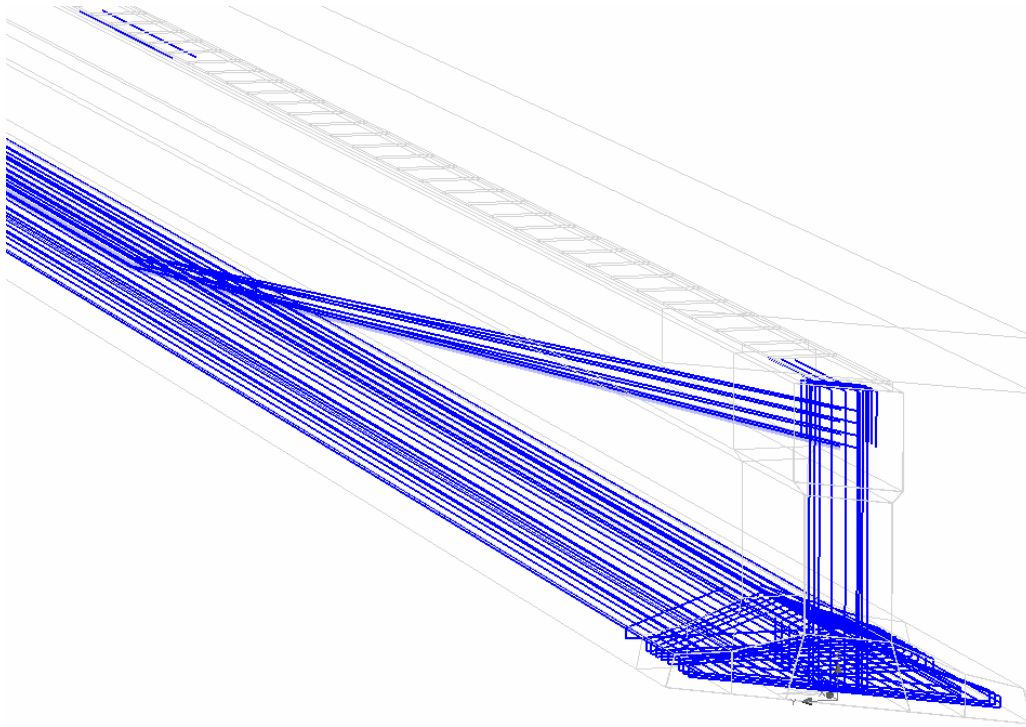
Prestressing cables and reinforcement in physical non-linear model of ZIP girder
